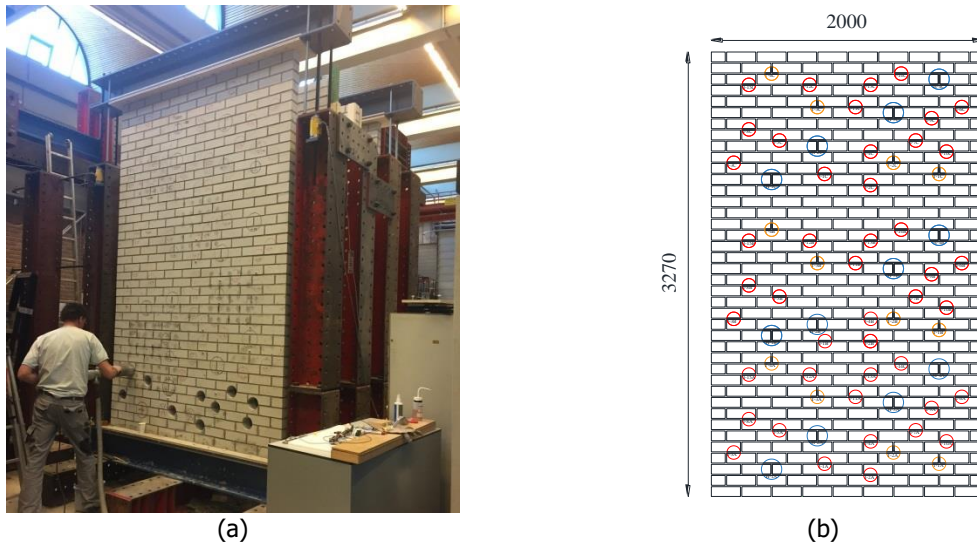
Extraction of masonry cores from the calcium silicate masonry wall, dimensions are in mm.
